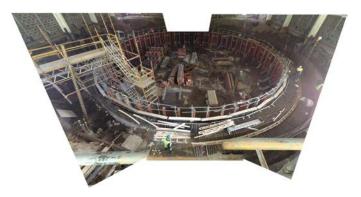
Shuttering in position for pouring the lower tank wall and the installation of rebar for the step which supports the wave makers and the, 30m diameter, upper tank wall.
